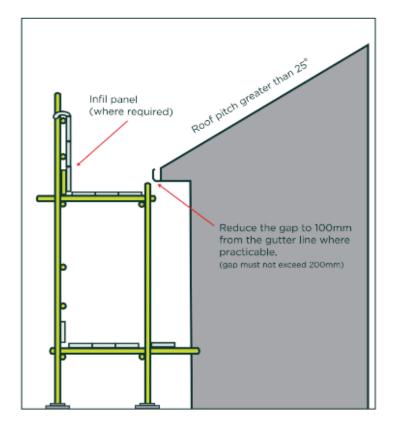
Roof edge protection for a roof pitch greater than 25 degrees
